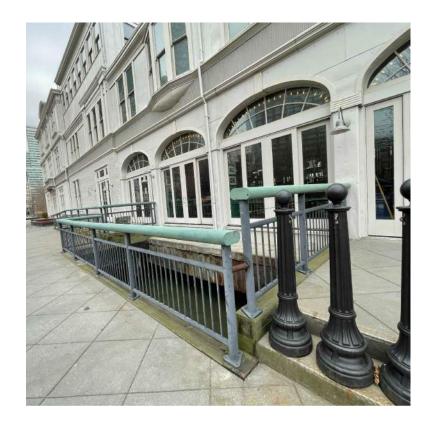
OPEN AREA #1 HANDRAILS
